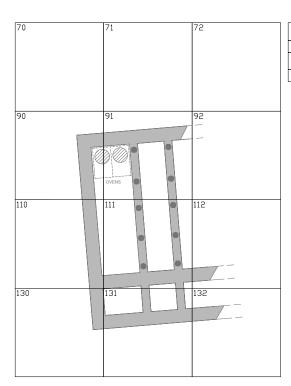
Plan of the dried-brick house (P. Dyczek, B. Wojciechowski)
